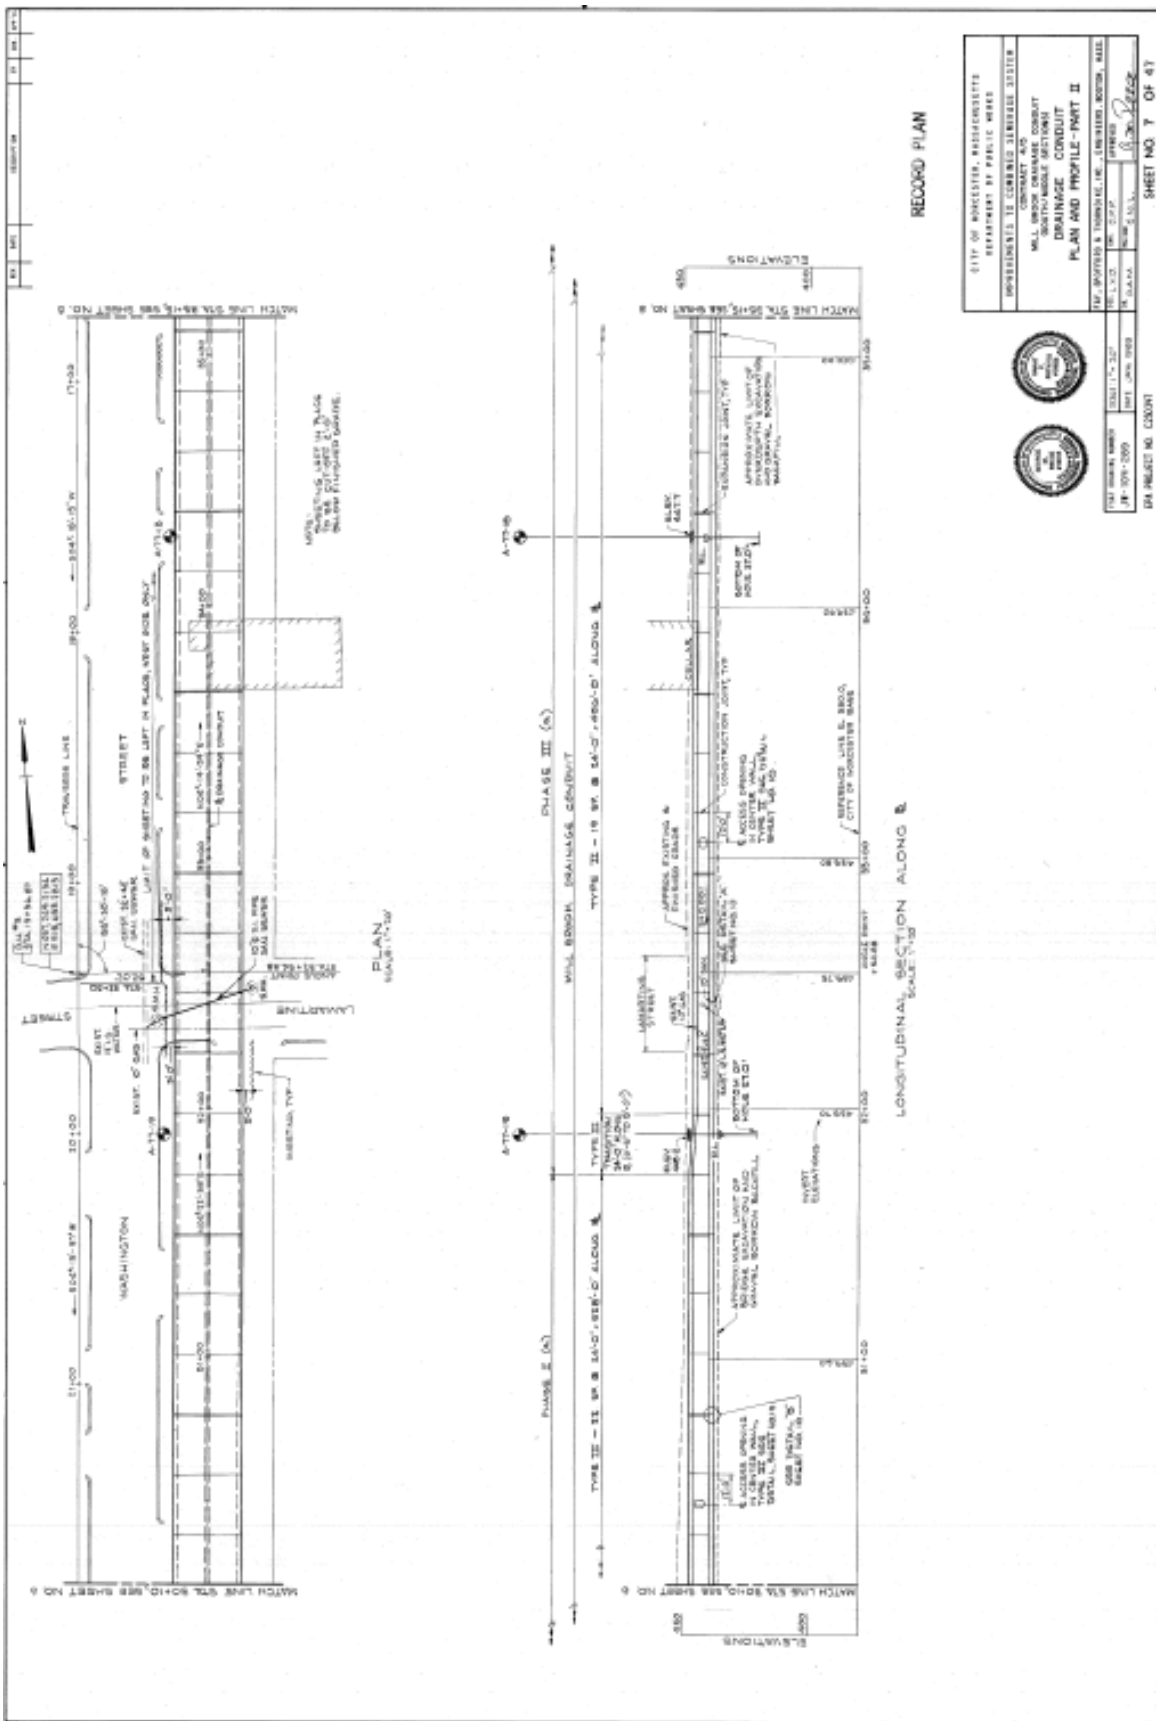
Improvements to Combined Sewerage System Contract No. 4-5 - Drainage Conduit Plan and Profile Part II
